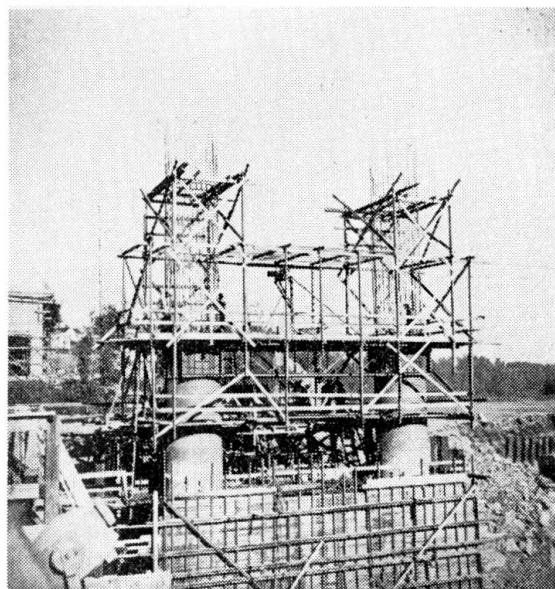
Columns under construction for a highway bridge across the river Indalsäven at Bergeforsen, Sweden
